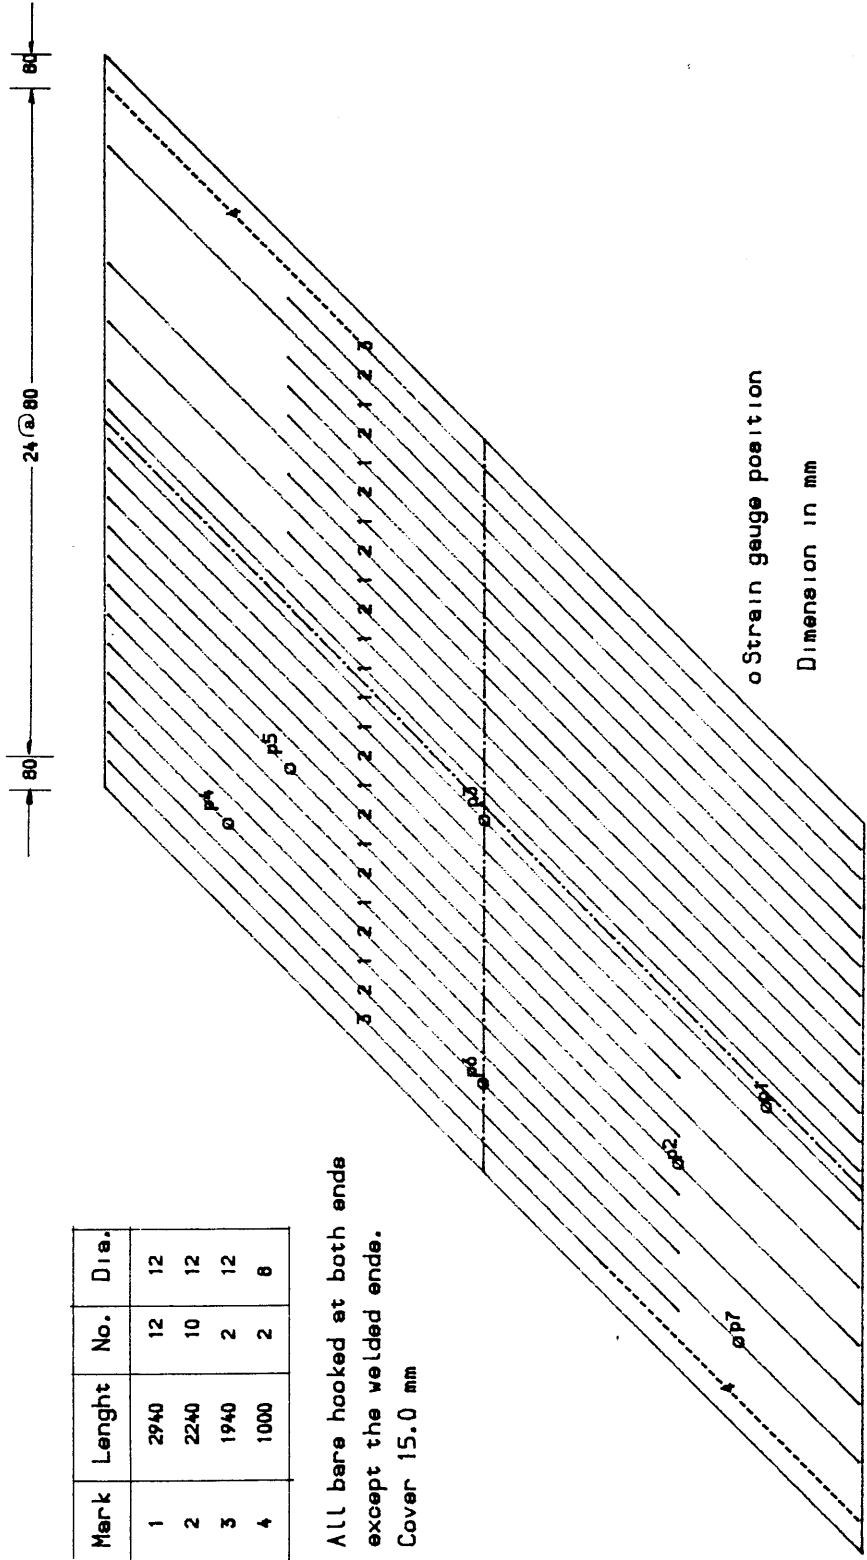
MODEL SKEW SLAB NO. (3) Details of bottom longitudinal steel parallel to the free edge and position of strain gauges
